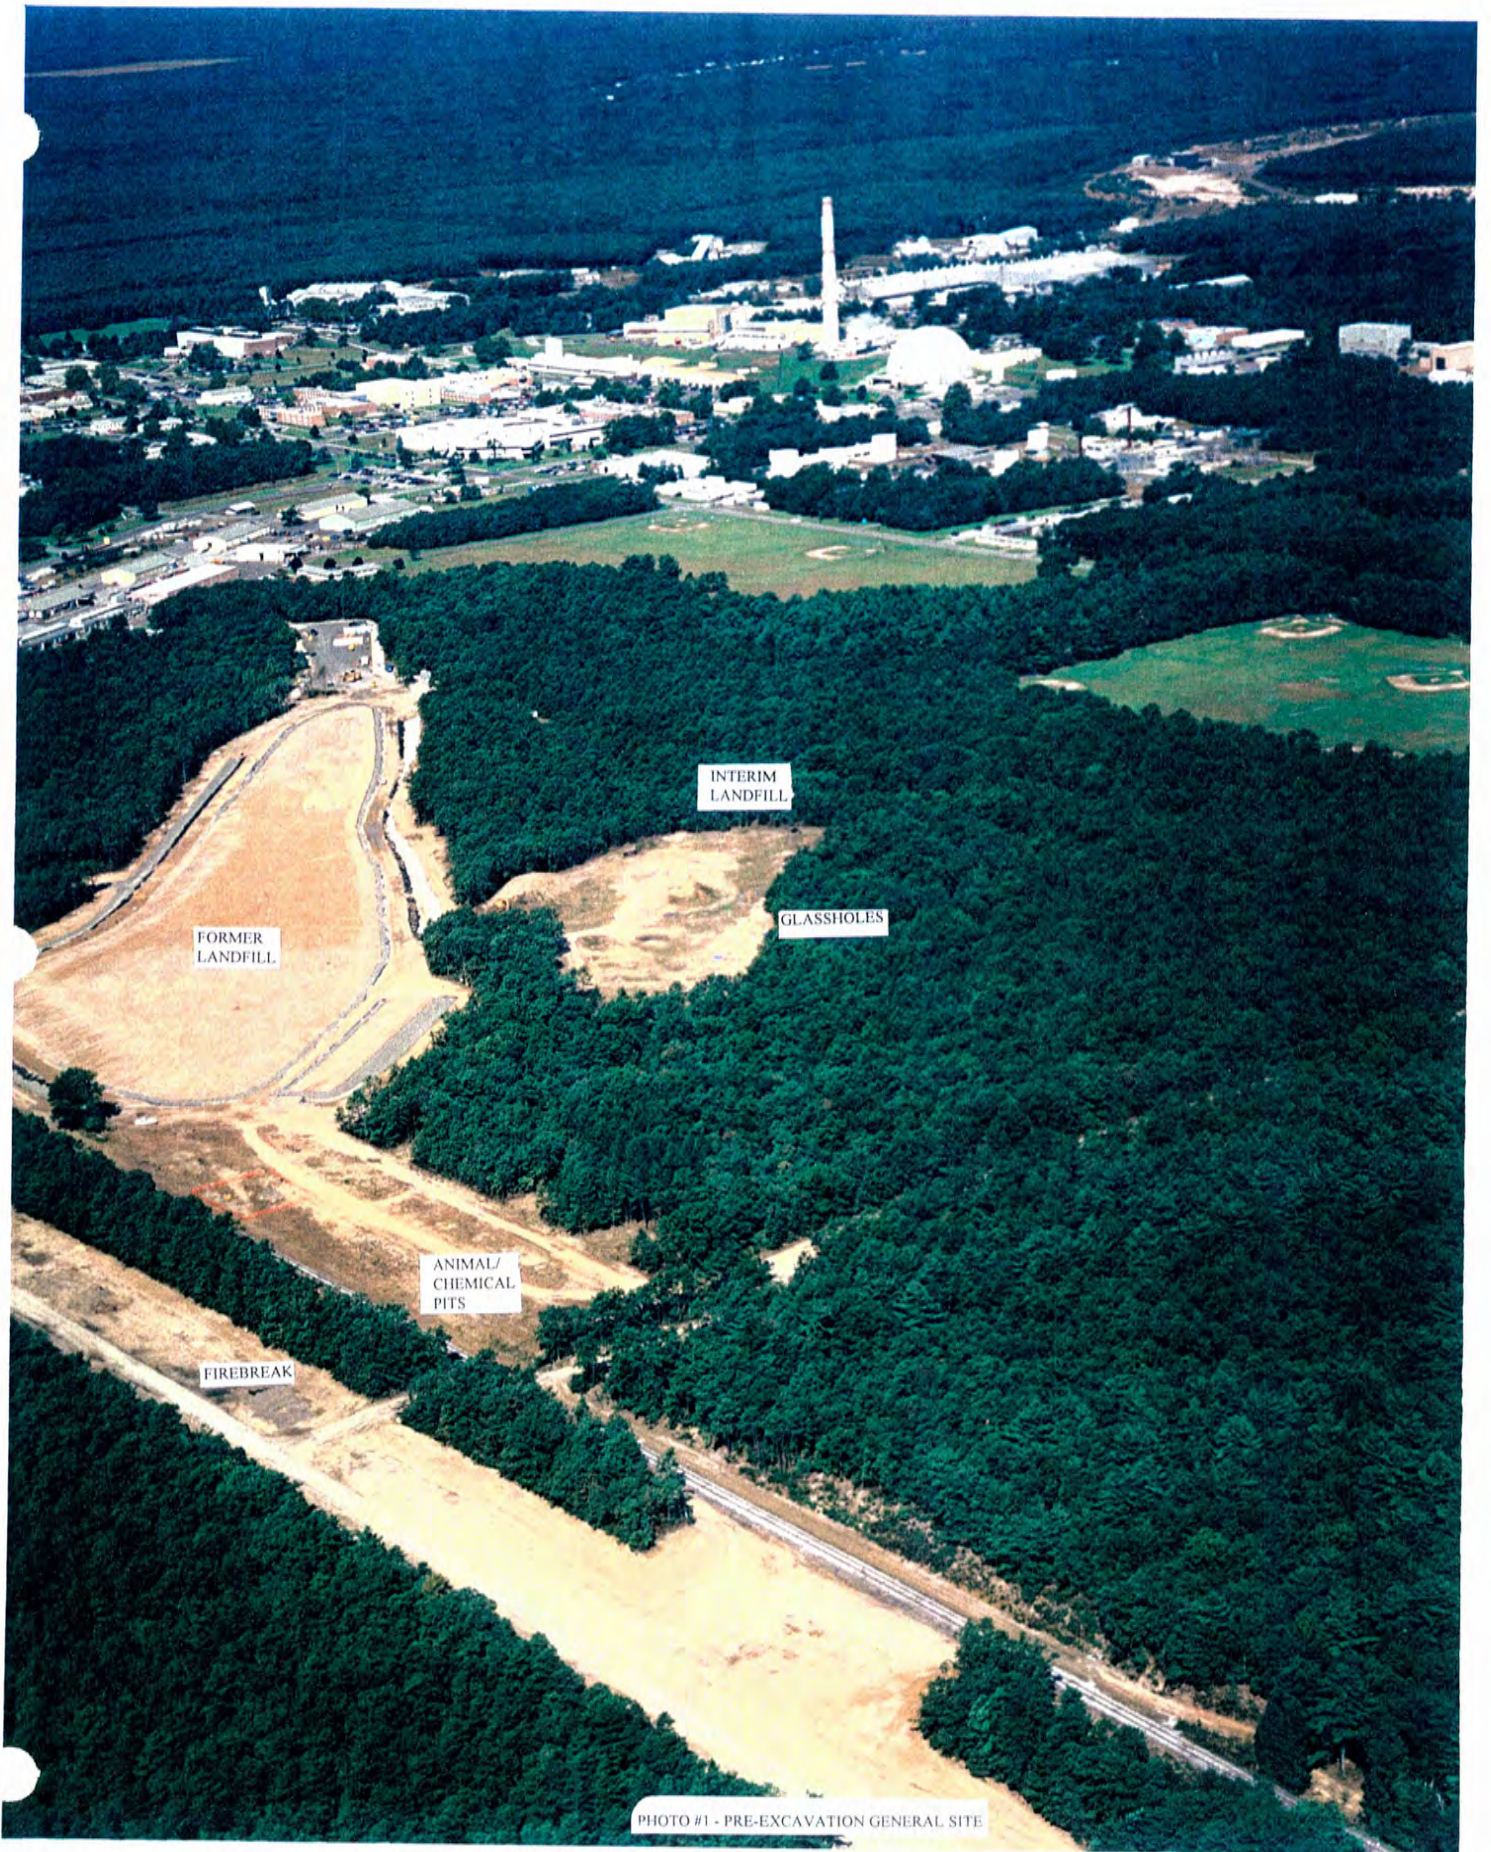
PRE-EXCAVATION GENERAL SITE
